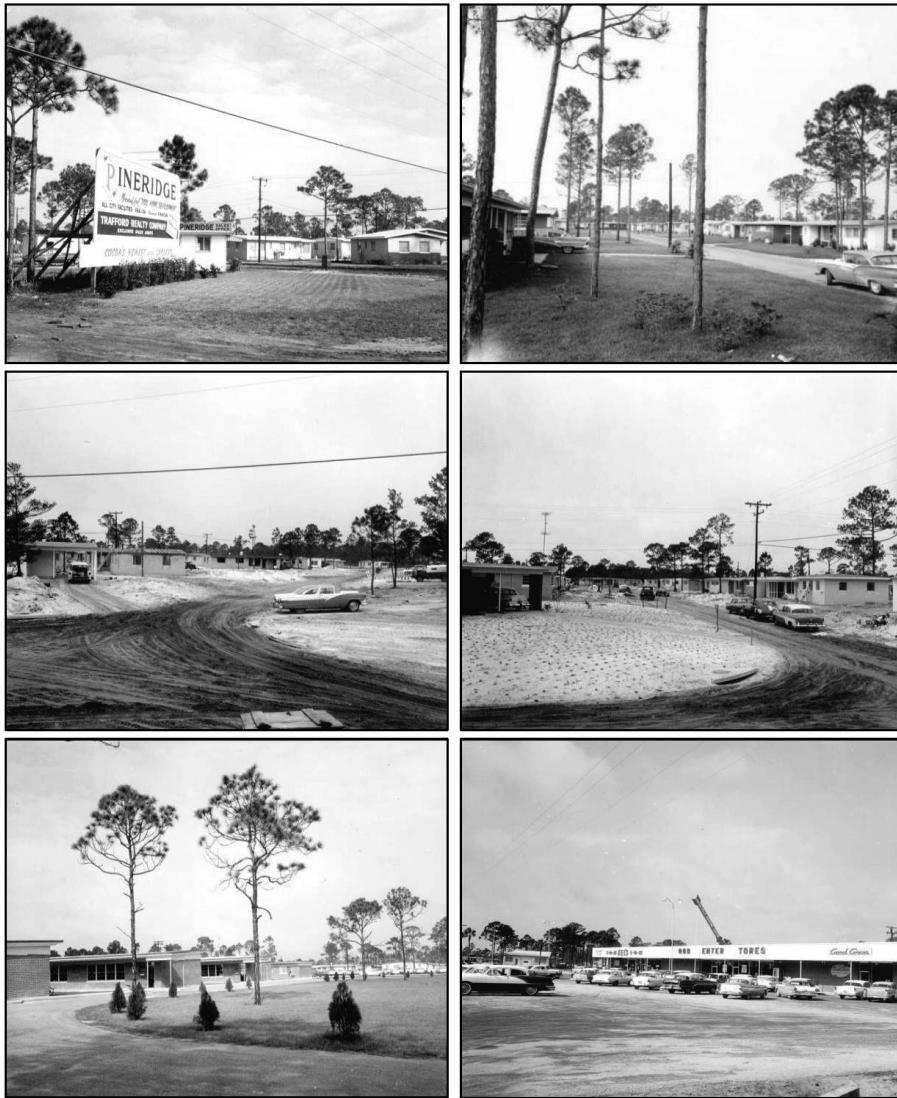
Clockwise from upper right: Pineridge after construction (1-3), shopping center, presumed to be at Dixon Boulevard and Pineda Street, elementary school, presumed to be current Endeavor School at 571 Pineda Street, Pine Ridge under construction ca. 1958 (Brown 1958).
